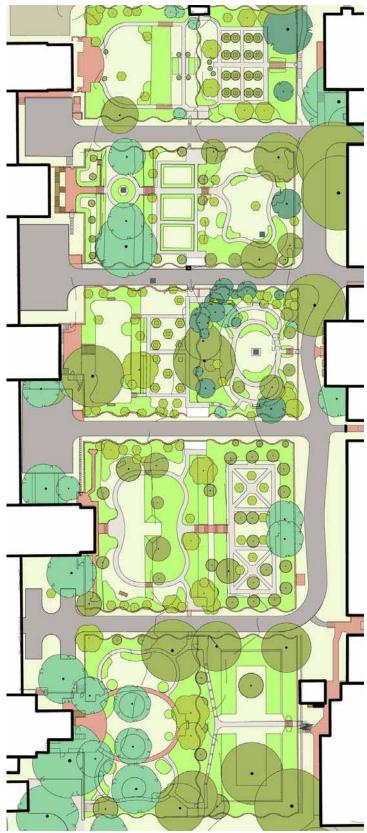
As built configuration of the East Gardens is depicted on this portion of the 1981 Plan. (R-JAV_16 1981-East Gardens detail HL.jpg)
